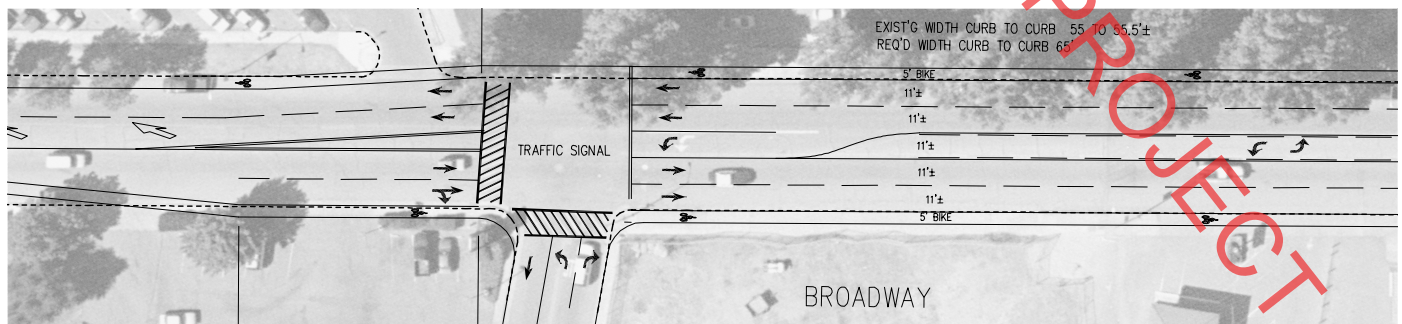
Suggested Lane Addition between Mildred Avenue and Canal Street
